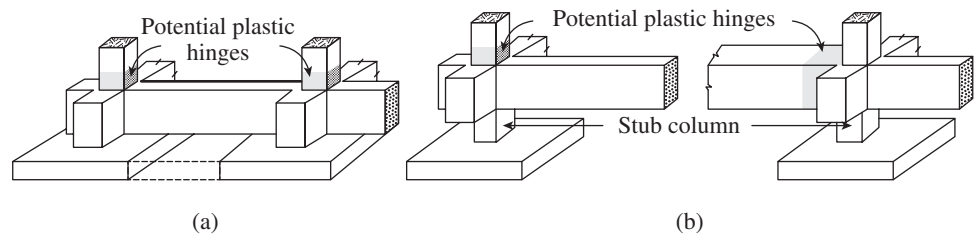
Footing with grade beams (a) Footing at shallow depth (b) Footing at deeper depth
